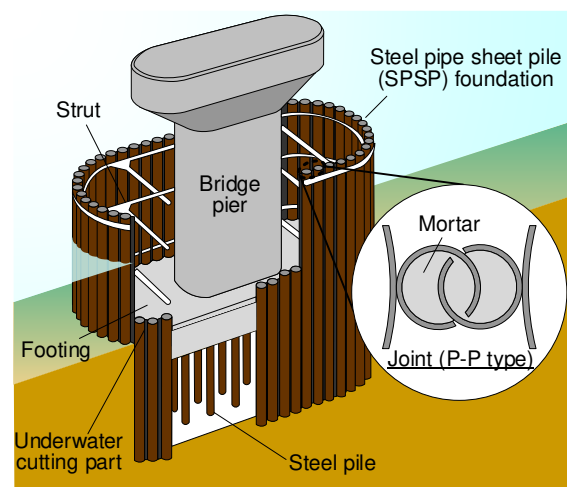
Steel pipe sheet pile (SPSP) foundation (modified after JASPP).
